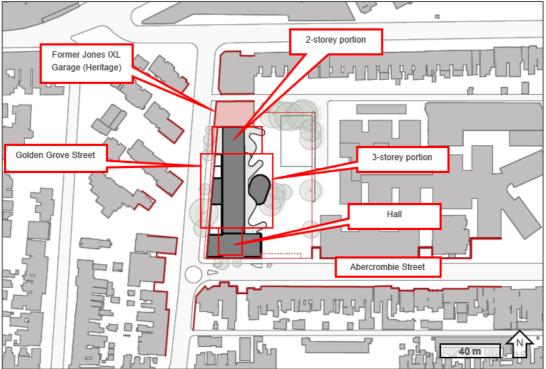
| Site layout (Source: Applicant's EIS 2020)
